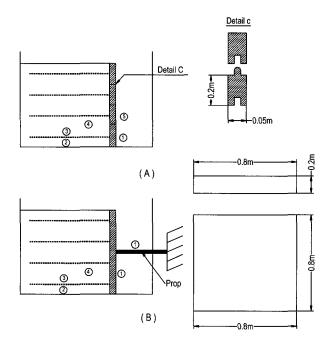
Construction sequence and the wall facing board in details: (a) block facing, (b) full continuous facing
